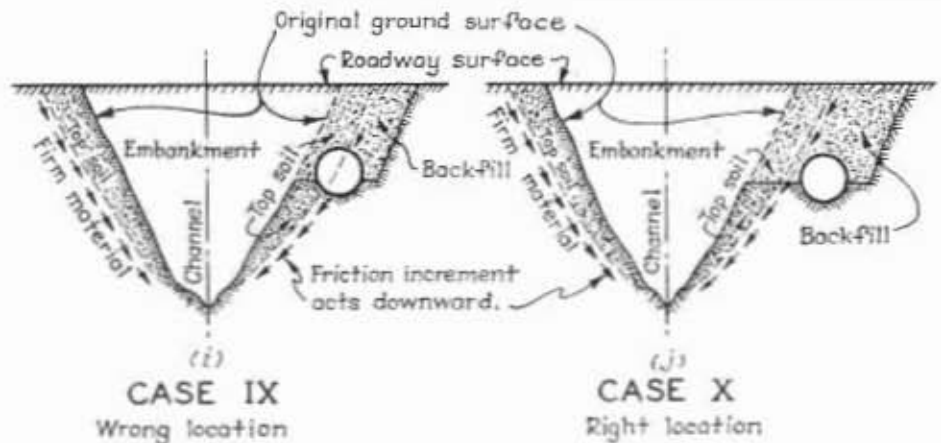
(i, j). Right and wrong way of installing culverts in sidehill location
